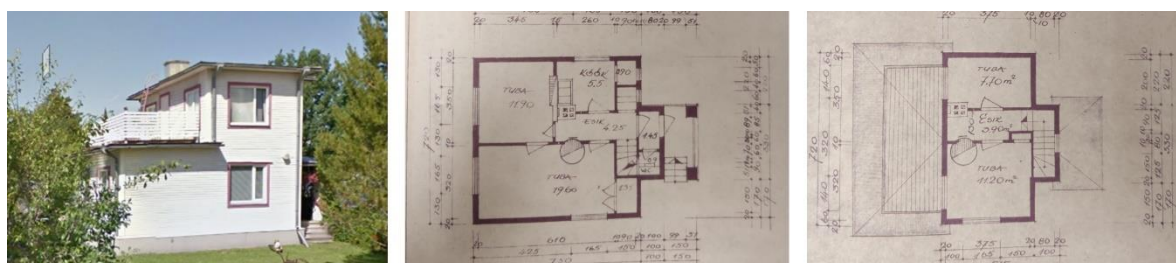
Uus 16 (1961) in Väike-Maarja (left to right: view, ground floor layout and upper floor layout)
